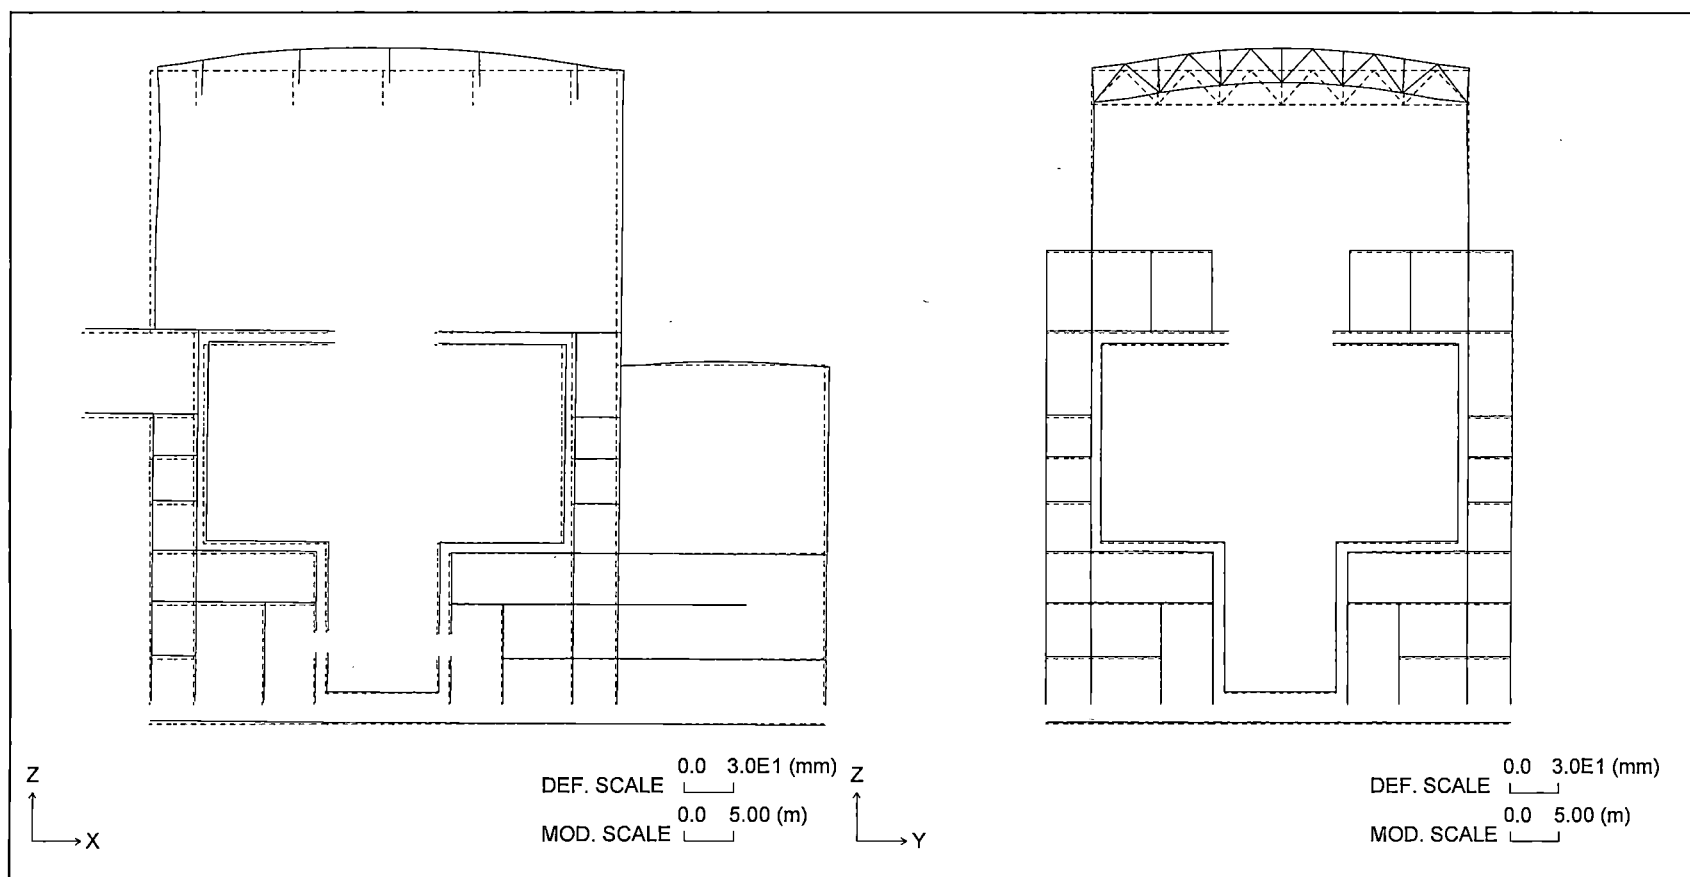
Section Deformation for Tornado Load (North Wind)
